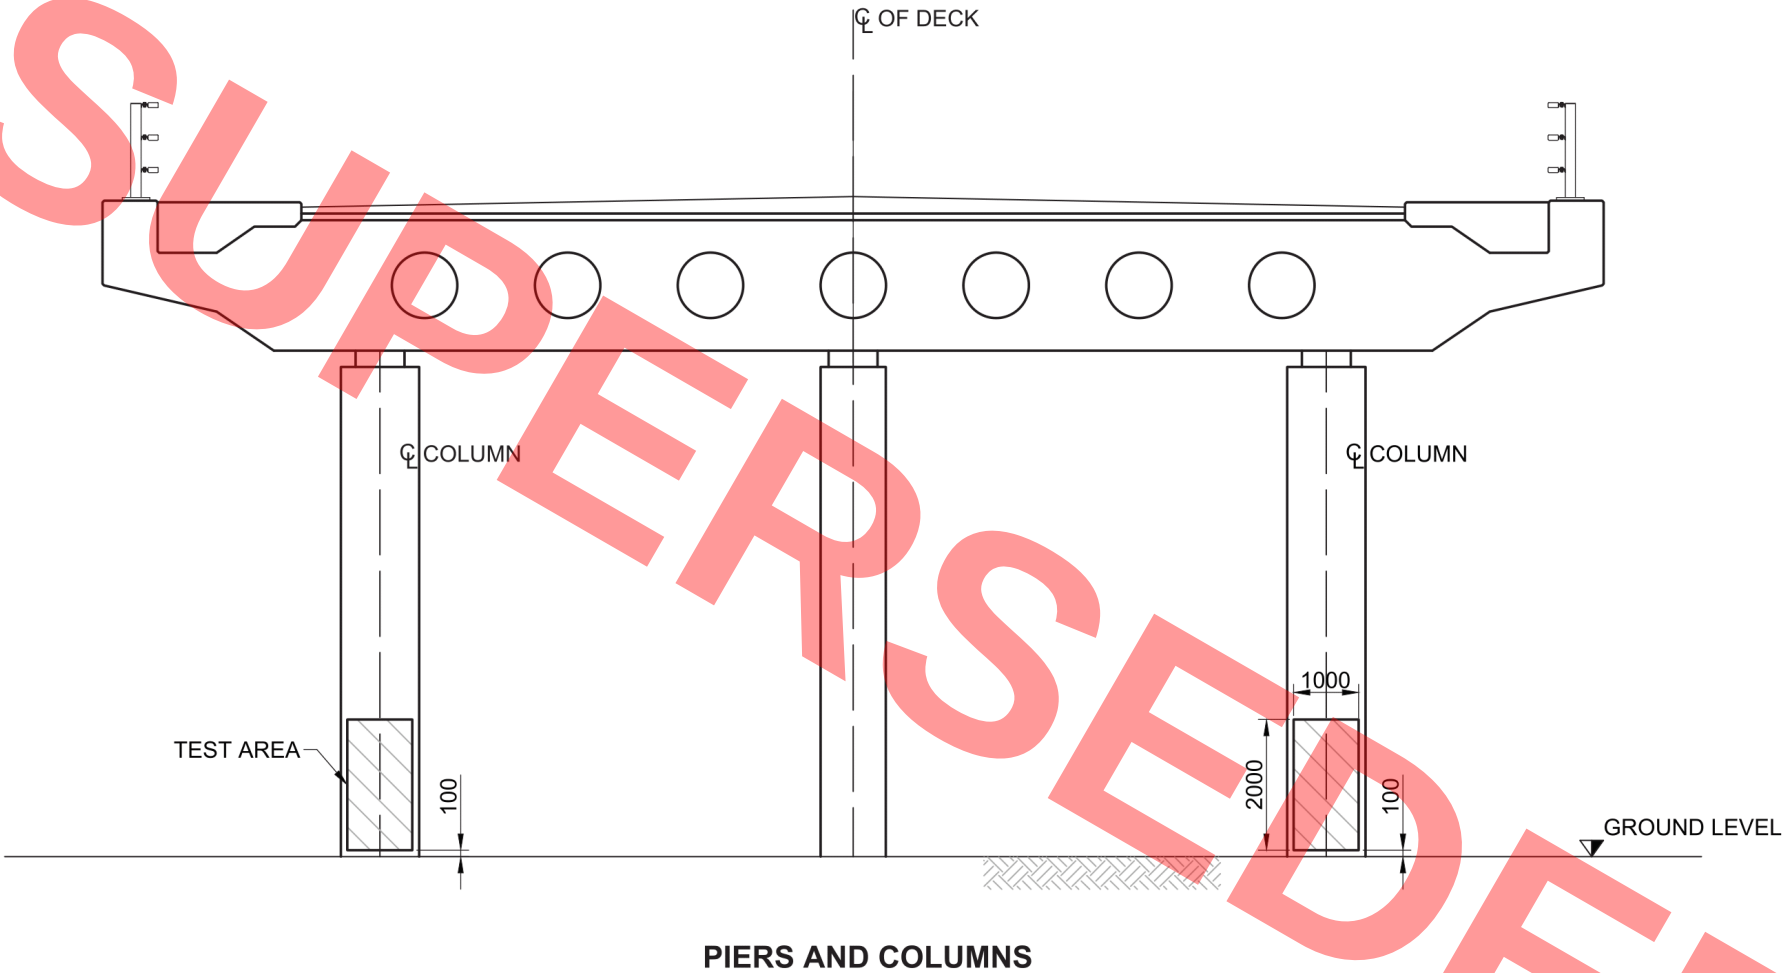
Location of test areas for reinforced piers and columns subject to salt traffic spray, bridges >26m wide
